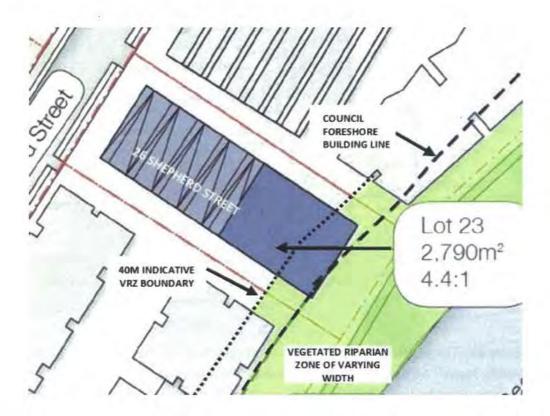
The development plan for the subject site at 26 Shepherd Street, Liverpool (from SJB 2016) showing the foreshore building line and indicative 40m riparian setback (VRZ) recommended by the NSW Office of Water. Note that the proposed building construction does not encroach into the inner 50% of the VRZ.
